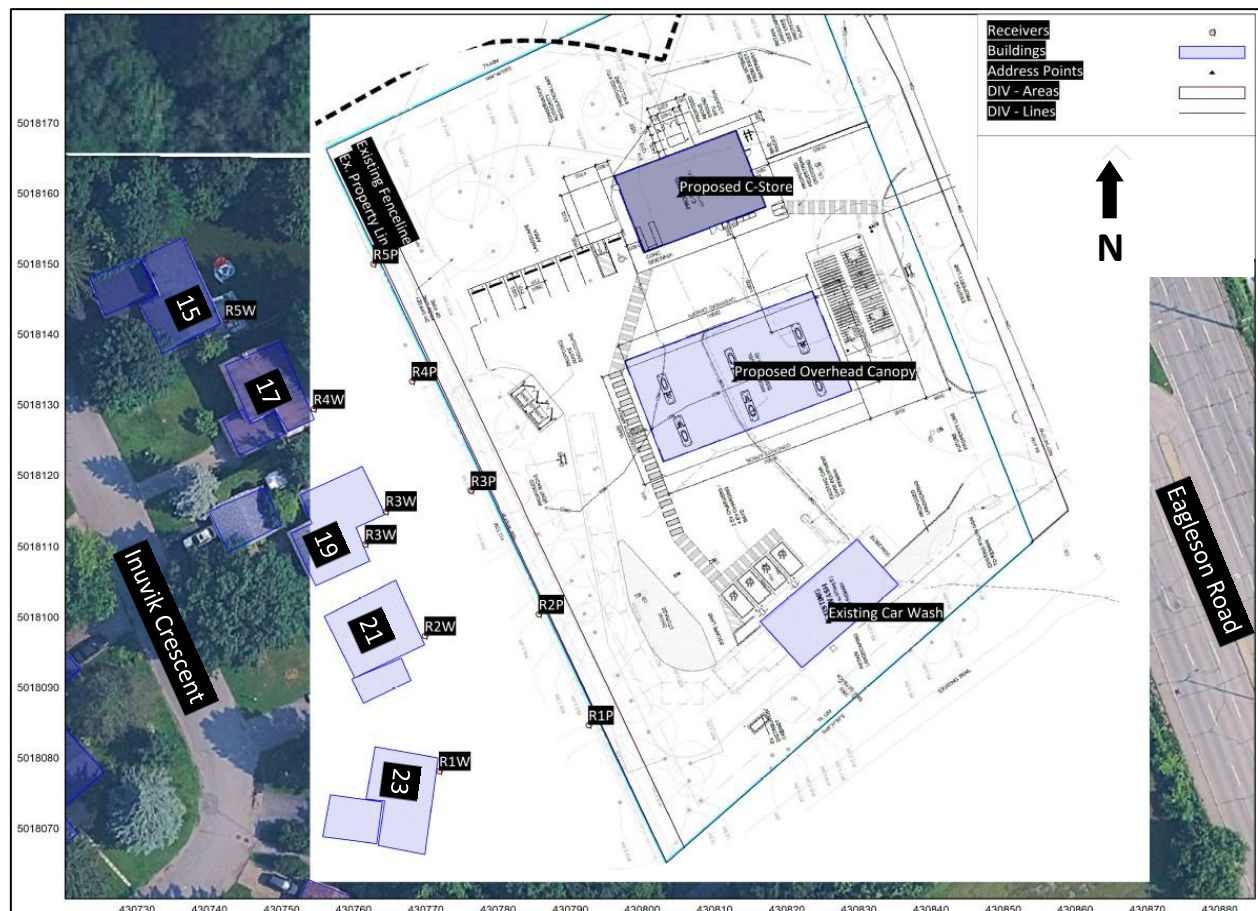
Proposed Site Plan – Shell Gas Station at 106 Eagleson Road, Kanata, ON.
